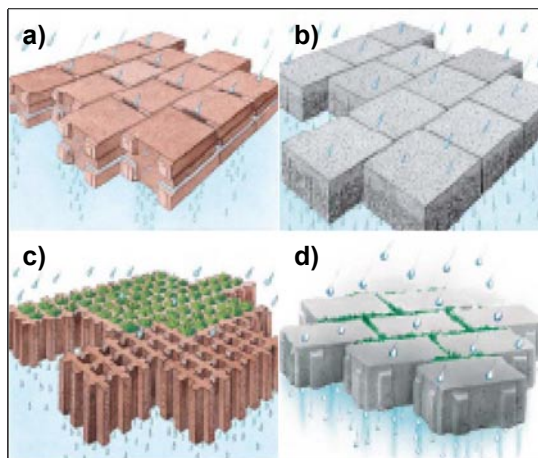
Types of permeable paving: a) pavers with canals b) porous pavers c) greened permeable pavers with small apertures d) greened permeable pavers with wide joints. (Dierkes et al. 2002.)
